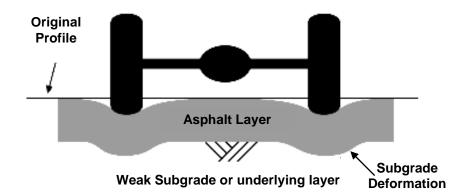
Structural rutting (Superpave Mix Design Superpave Series No. 2 (SP-2), Asphalt Institute)
